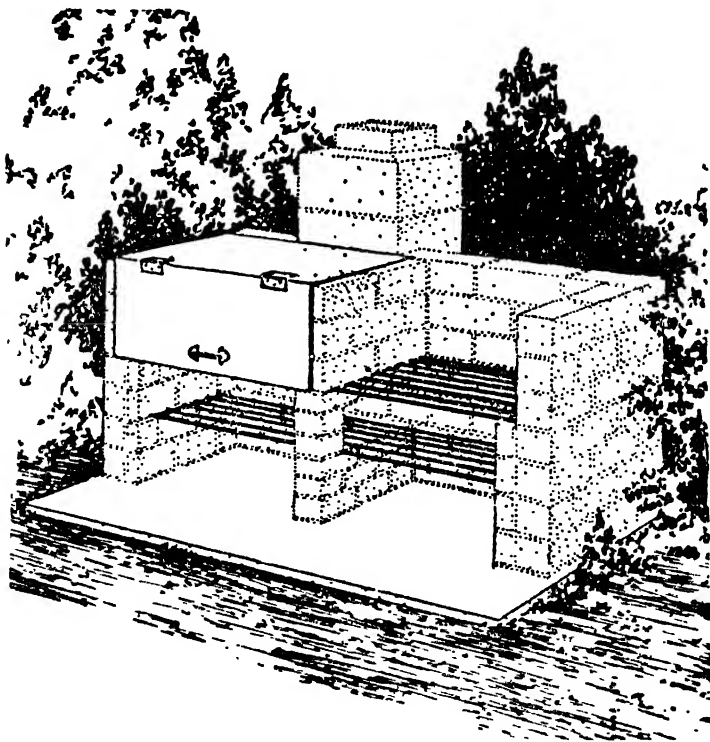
,843.—View of completed concrete masonry barbecue pit or stove .
